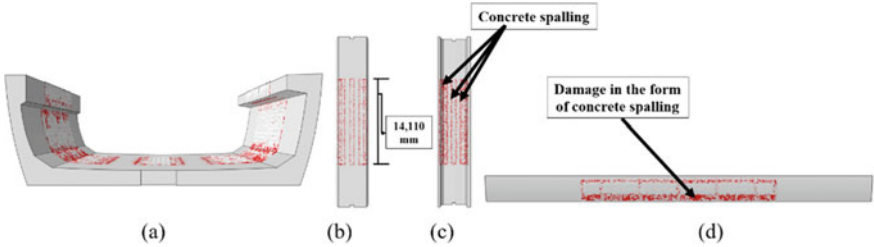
Pattern of cracks in the girder under peak overpressure of 982 MPa, with the rolling stock at mid-span section: a Cross-section, b Bottom side, c Top side, and d Flange along the span
